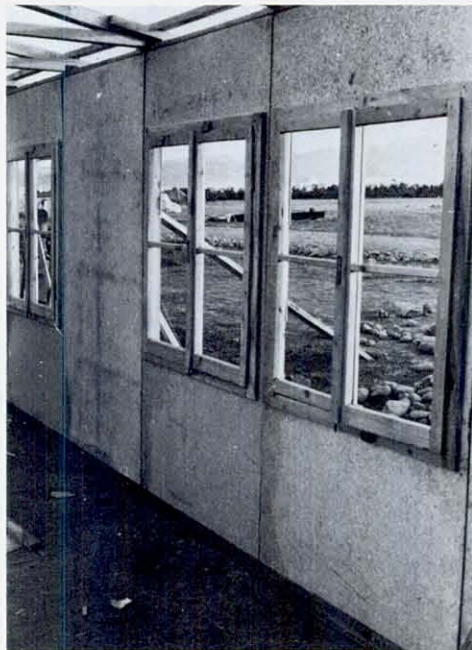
Interior of a prefabricated building being erected in Bingöl.
